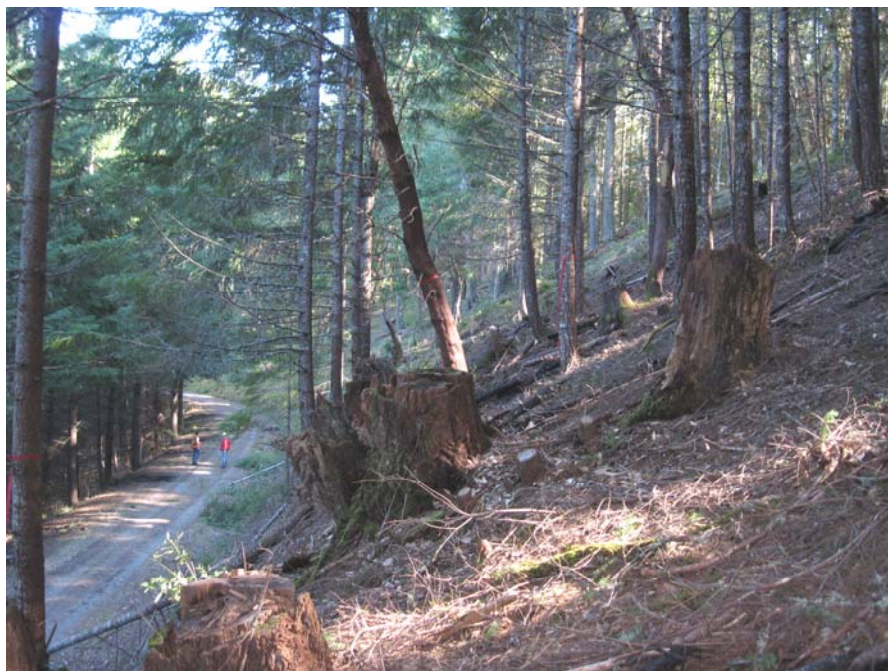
Topography of the first 300 ft of proposed road construction.
